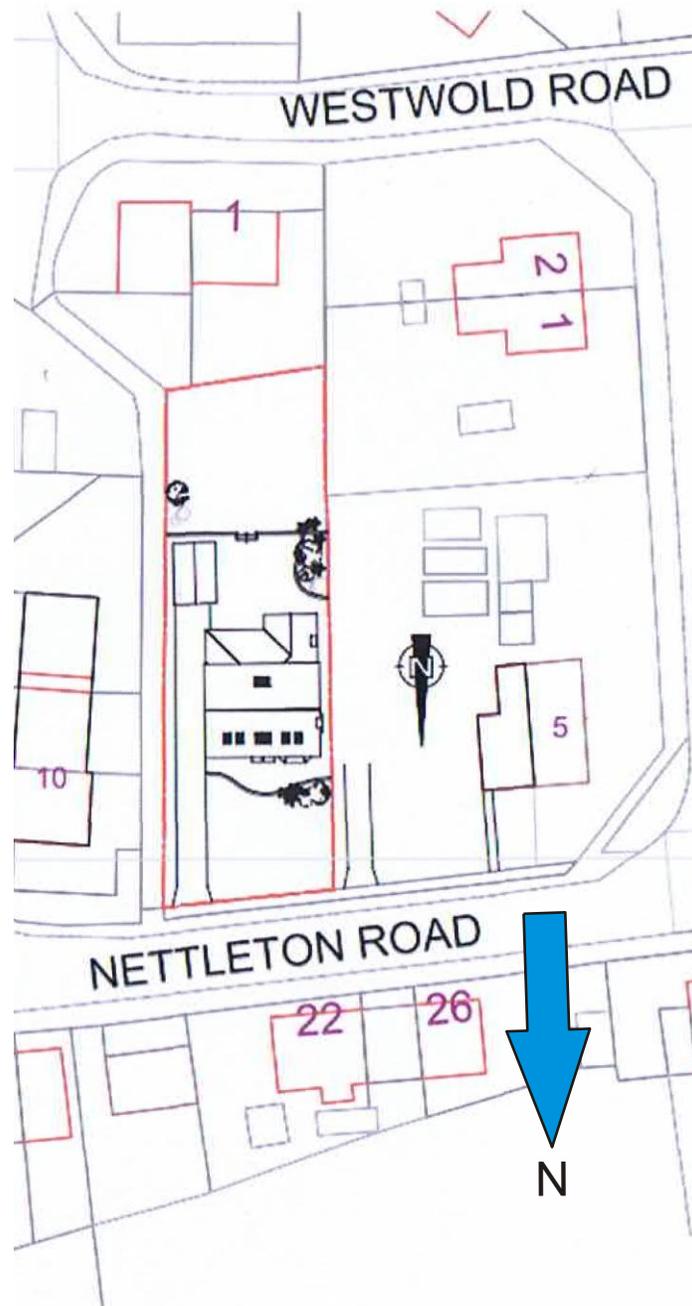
Proposed site layout at an original scale of 1:500 at A3, (extract from Architects plan)
